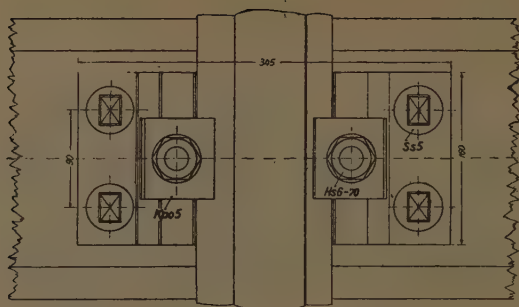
Plan of rail on intermediate sleeper (wood).
